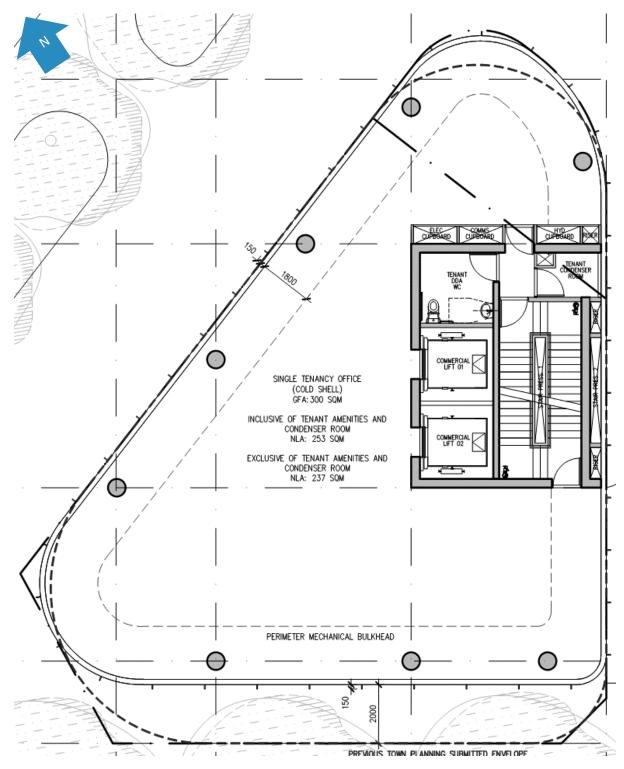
Proposed Floor Plans – Level 6 to Level 10 (Image Source: Elenberg Fraser)
